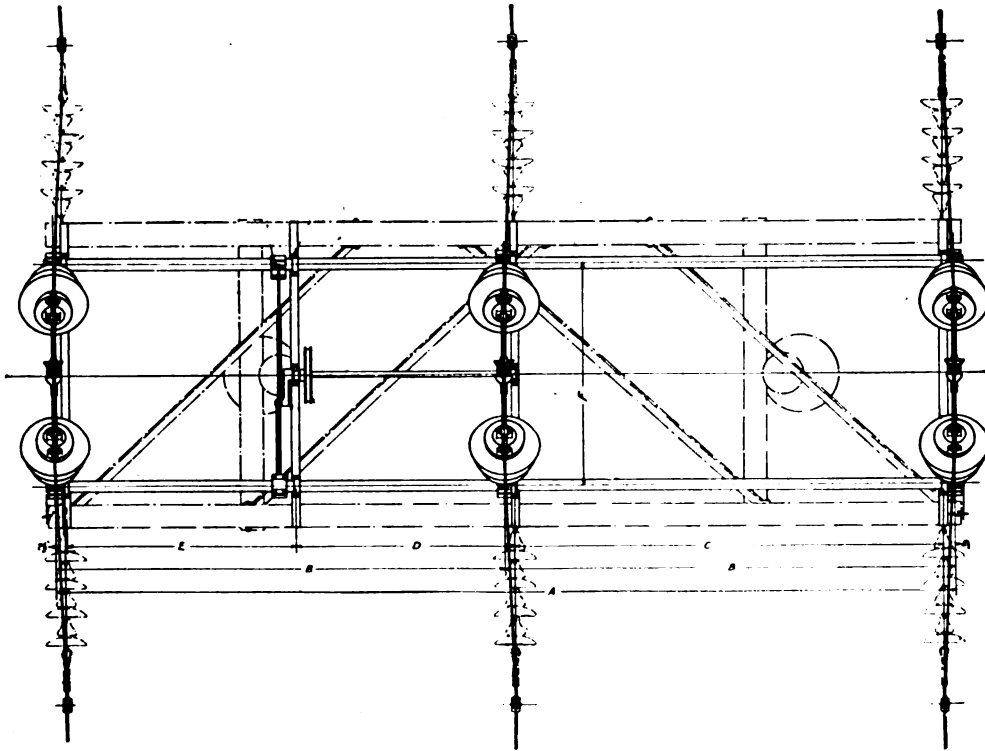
TYPE T-FC HORN-GAP SWITCH SHOWING TYPICAL PLAN VIEW WITH A TWO-WOODEN-POLE MOUNTING
